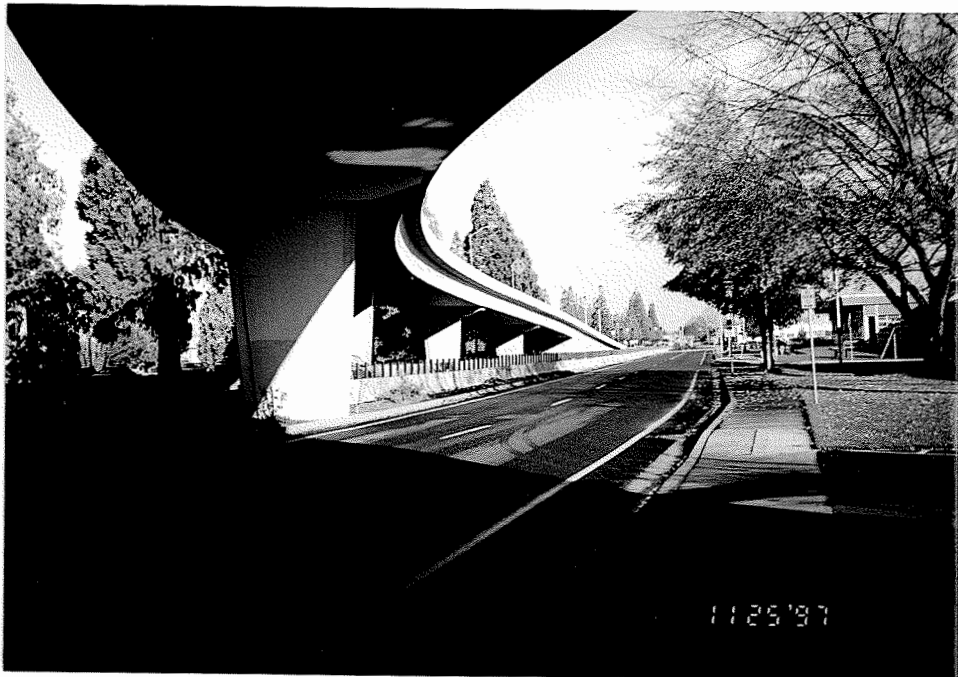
Bridge #9669A, wall-supported approach on the north end.
